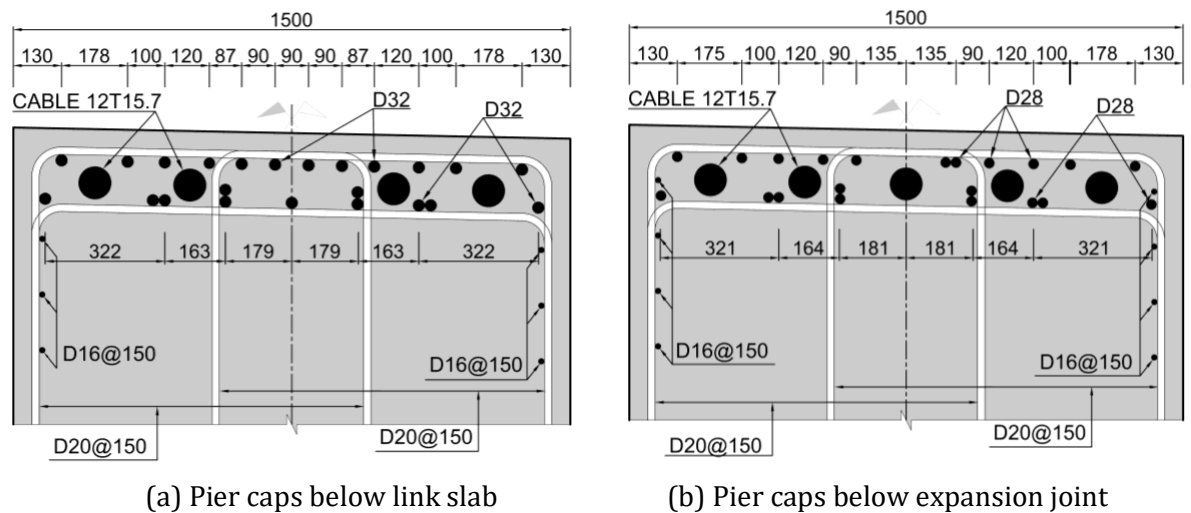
Layout of conventional reinforcement in a typical PPC pier cap
